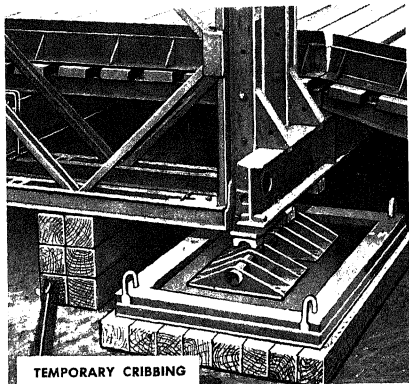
Double-truss bridge jacked up and cribbed at end where transom is in end post before insertion of outer truss.
